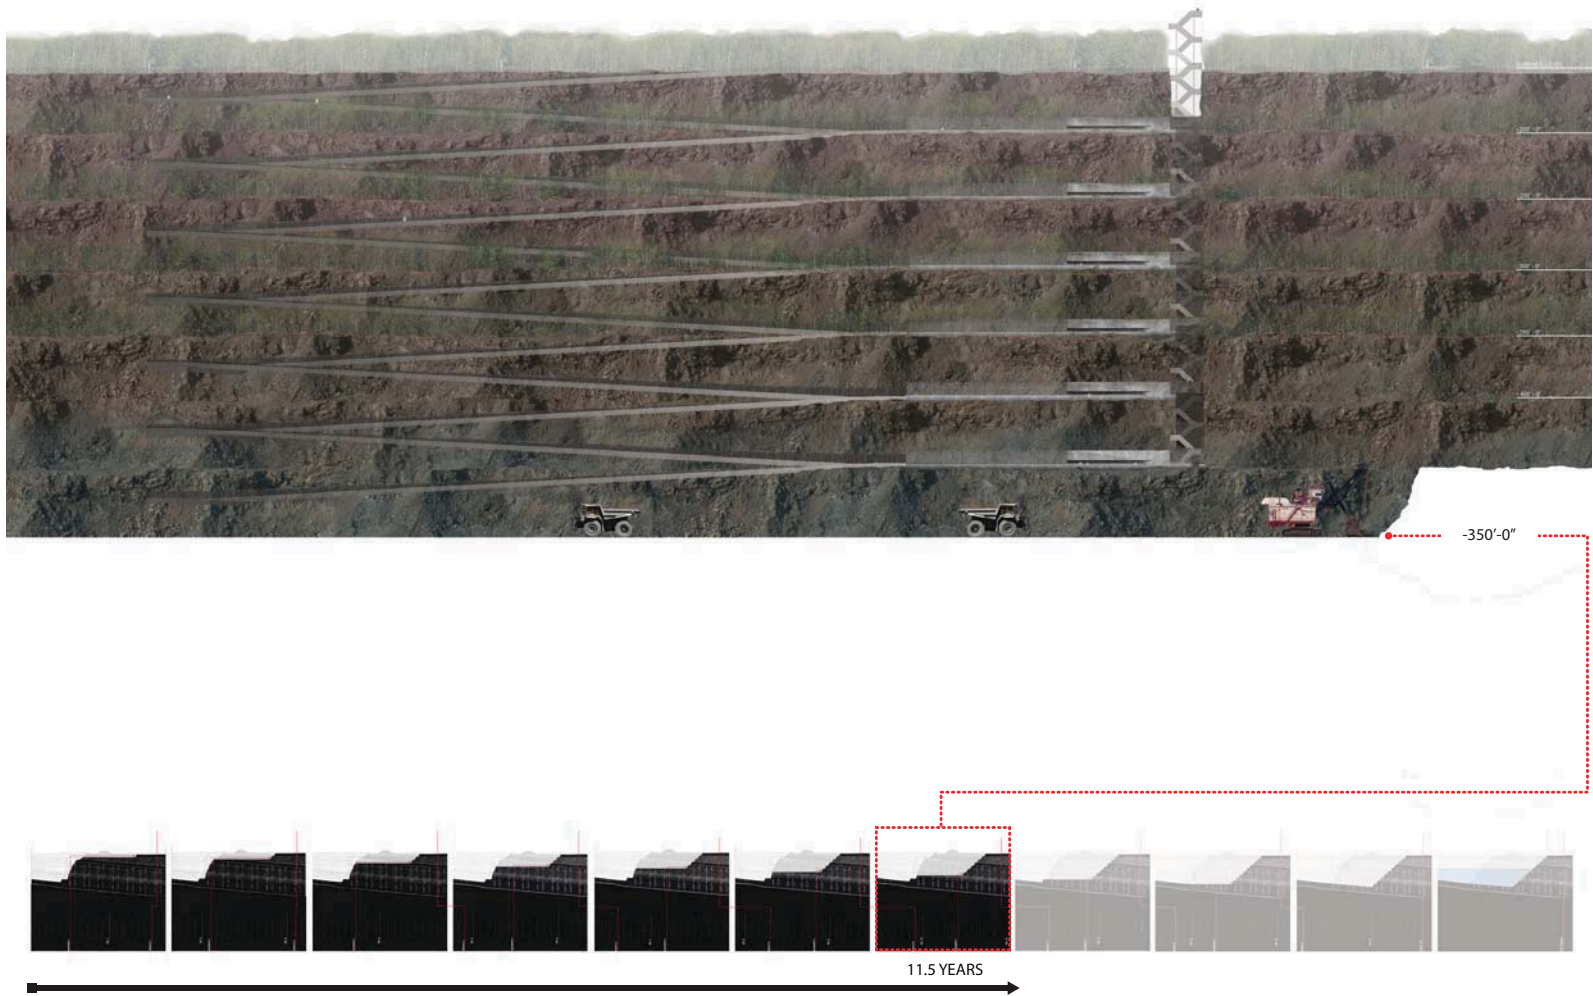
Elevation and Section of Site Change Sequence, Bench 7.
